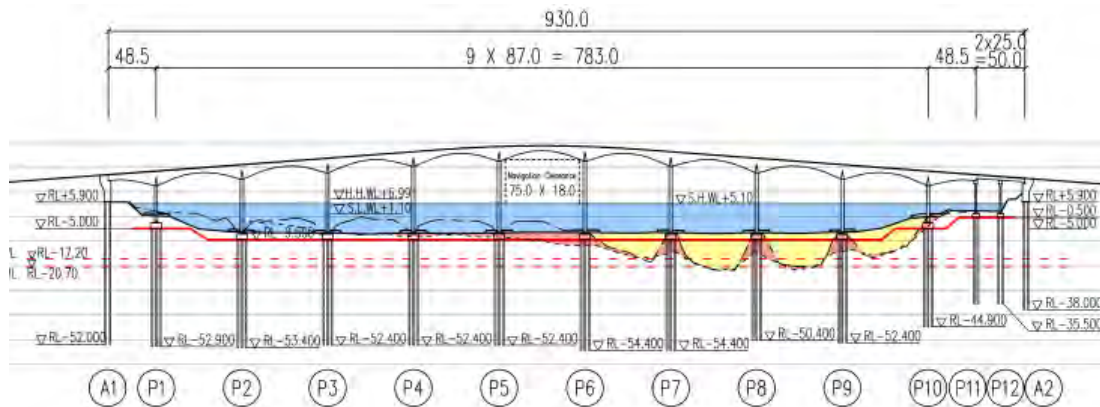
Longitudinal Profile of Existing Meghna Bridge (1995)
